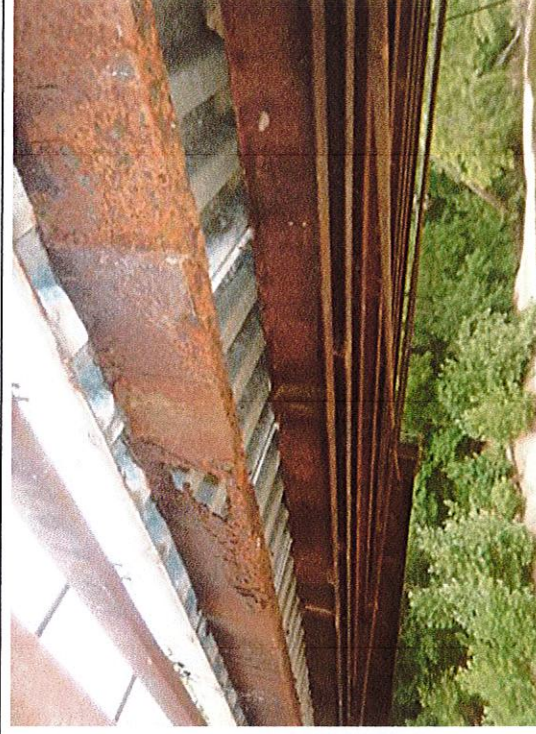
SPAN 4, PANEL 3, STRINGER 1: Severe section loss in stringer
